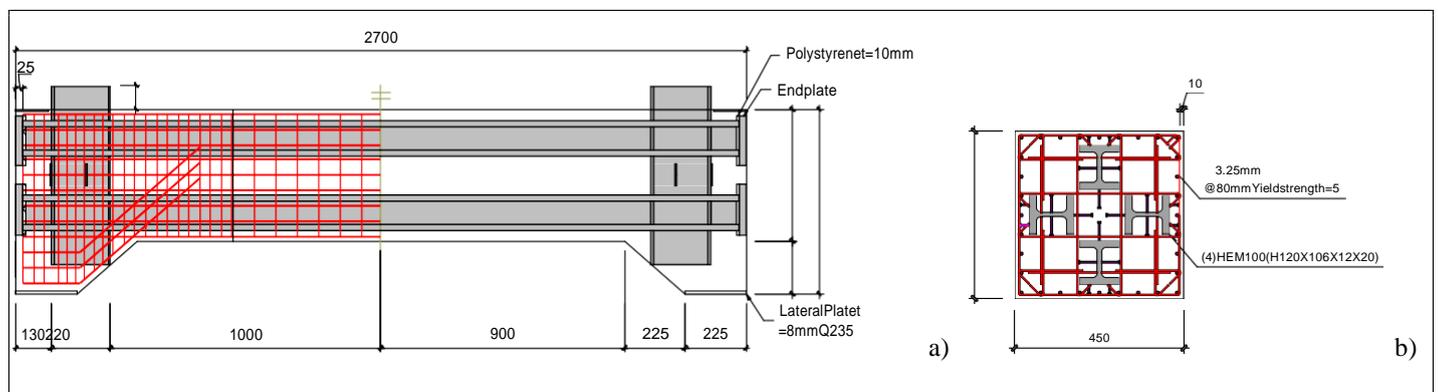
Details of the static tests: a) steel layout - longitudinal view; b) Cross-section details
